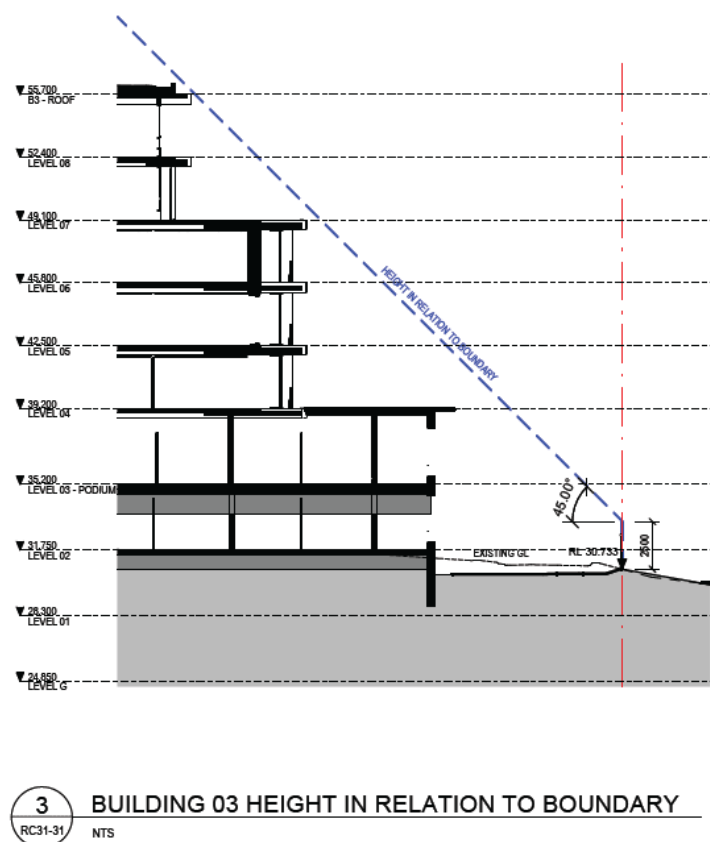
HiRB cross section Building 3 relative to the east side Rukutai Street properties (Refer WAM RC Drawings RC31-31).
